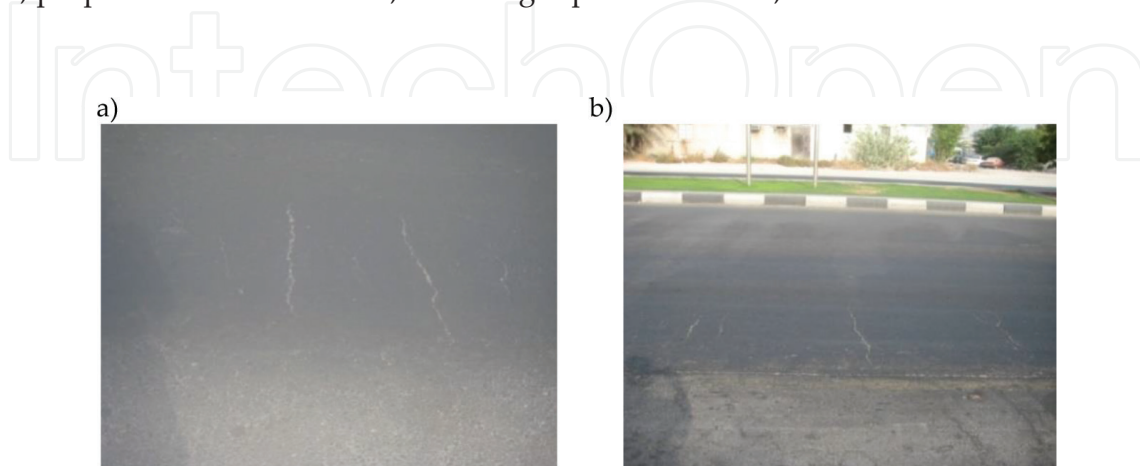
Fatigue failure of asphalt concrete pavement: transverse fatigue cracks (Sharjah city, United Arab Emirates, August, 2010).
